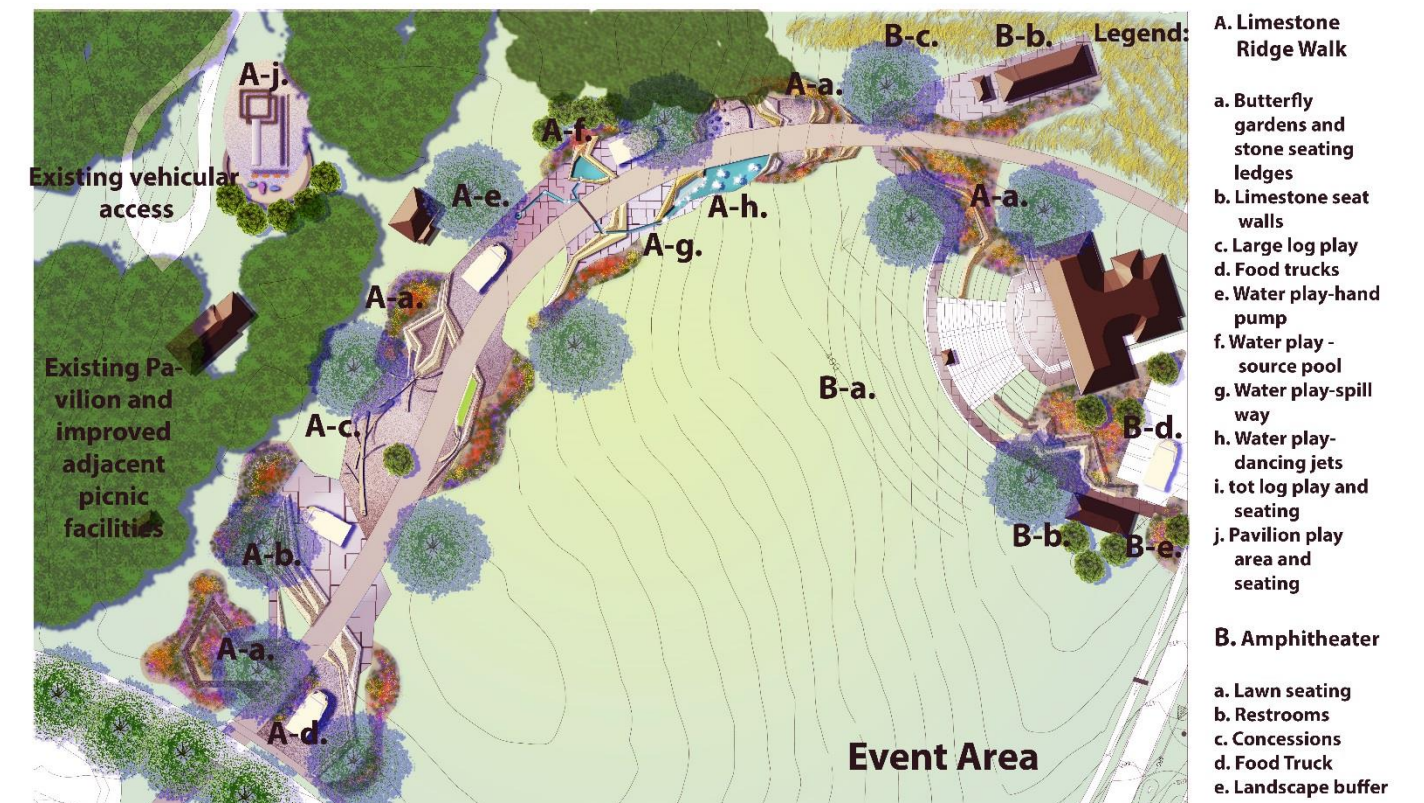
Limestone Log Play Area Detail Illustration (Master Plan Item #44)
